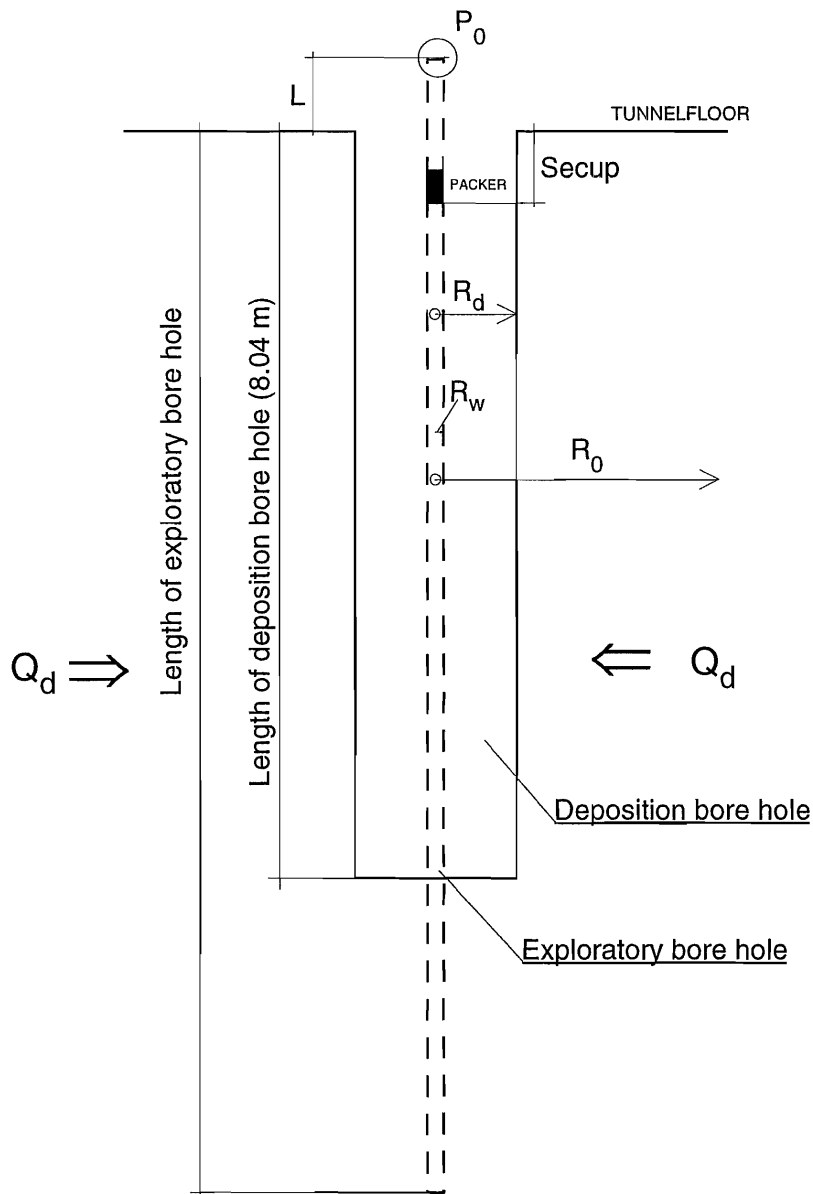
Schematic layout of deposition bore hole and exploratory bore hole
